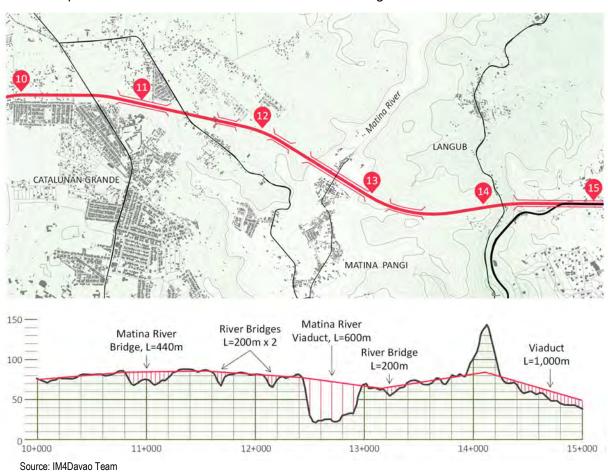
Conceptual Road Construction Plan in Langub Section
